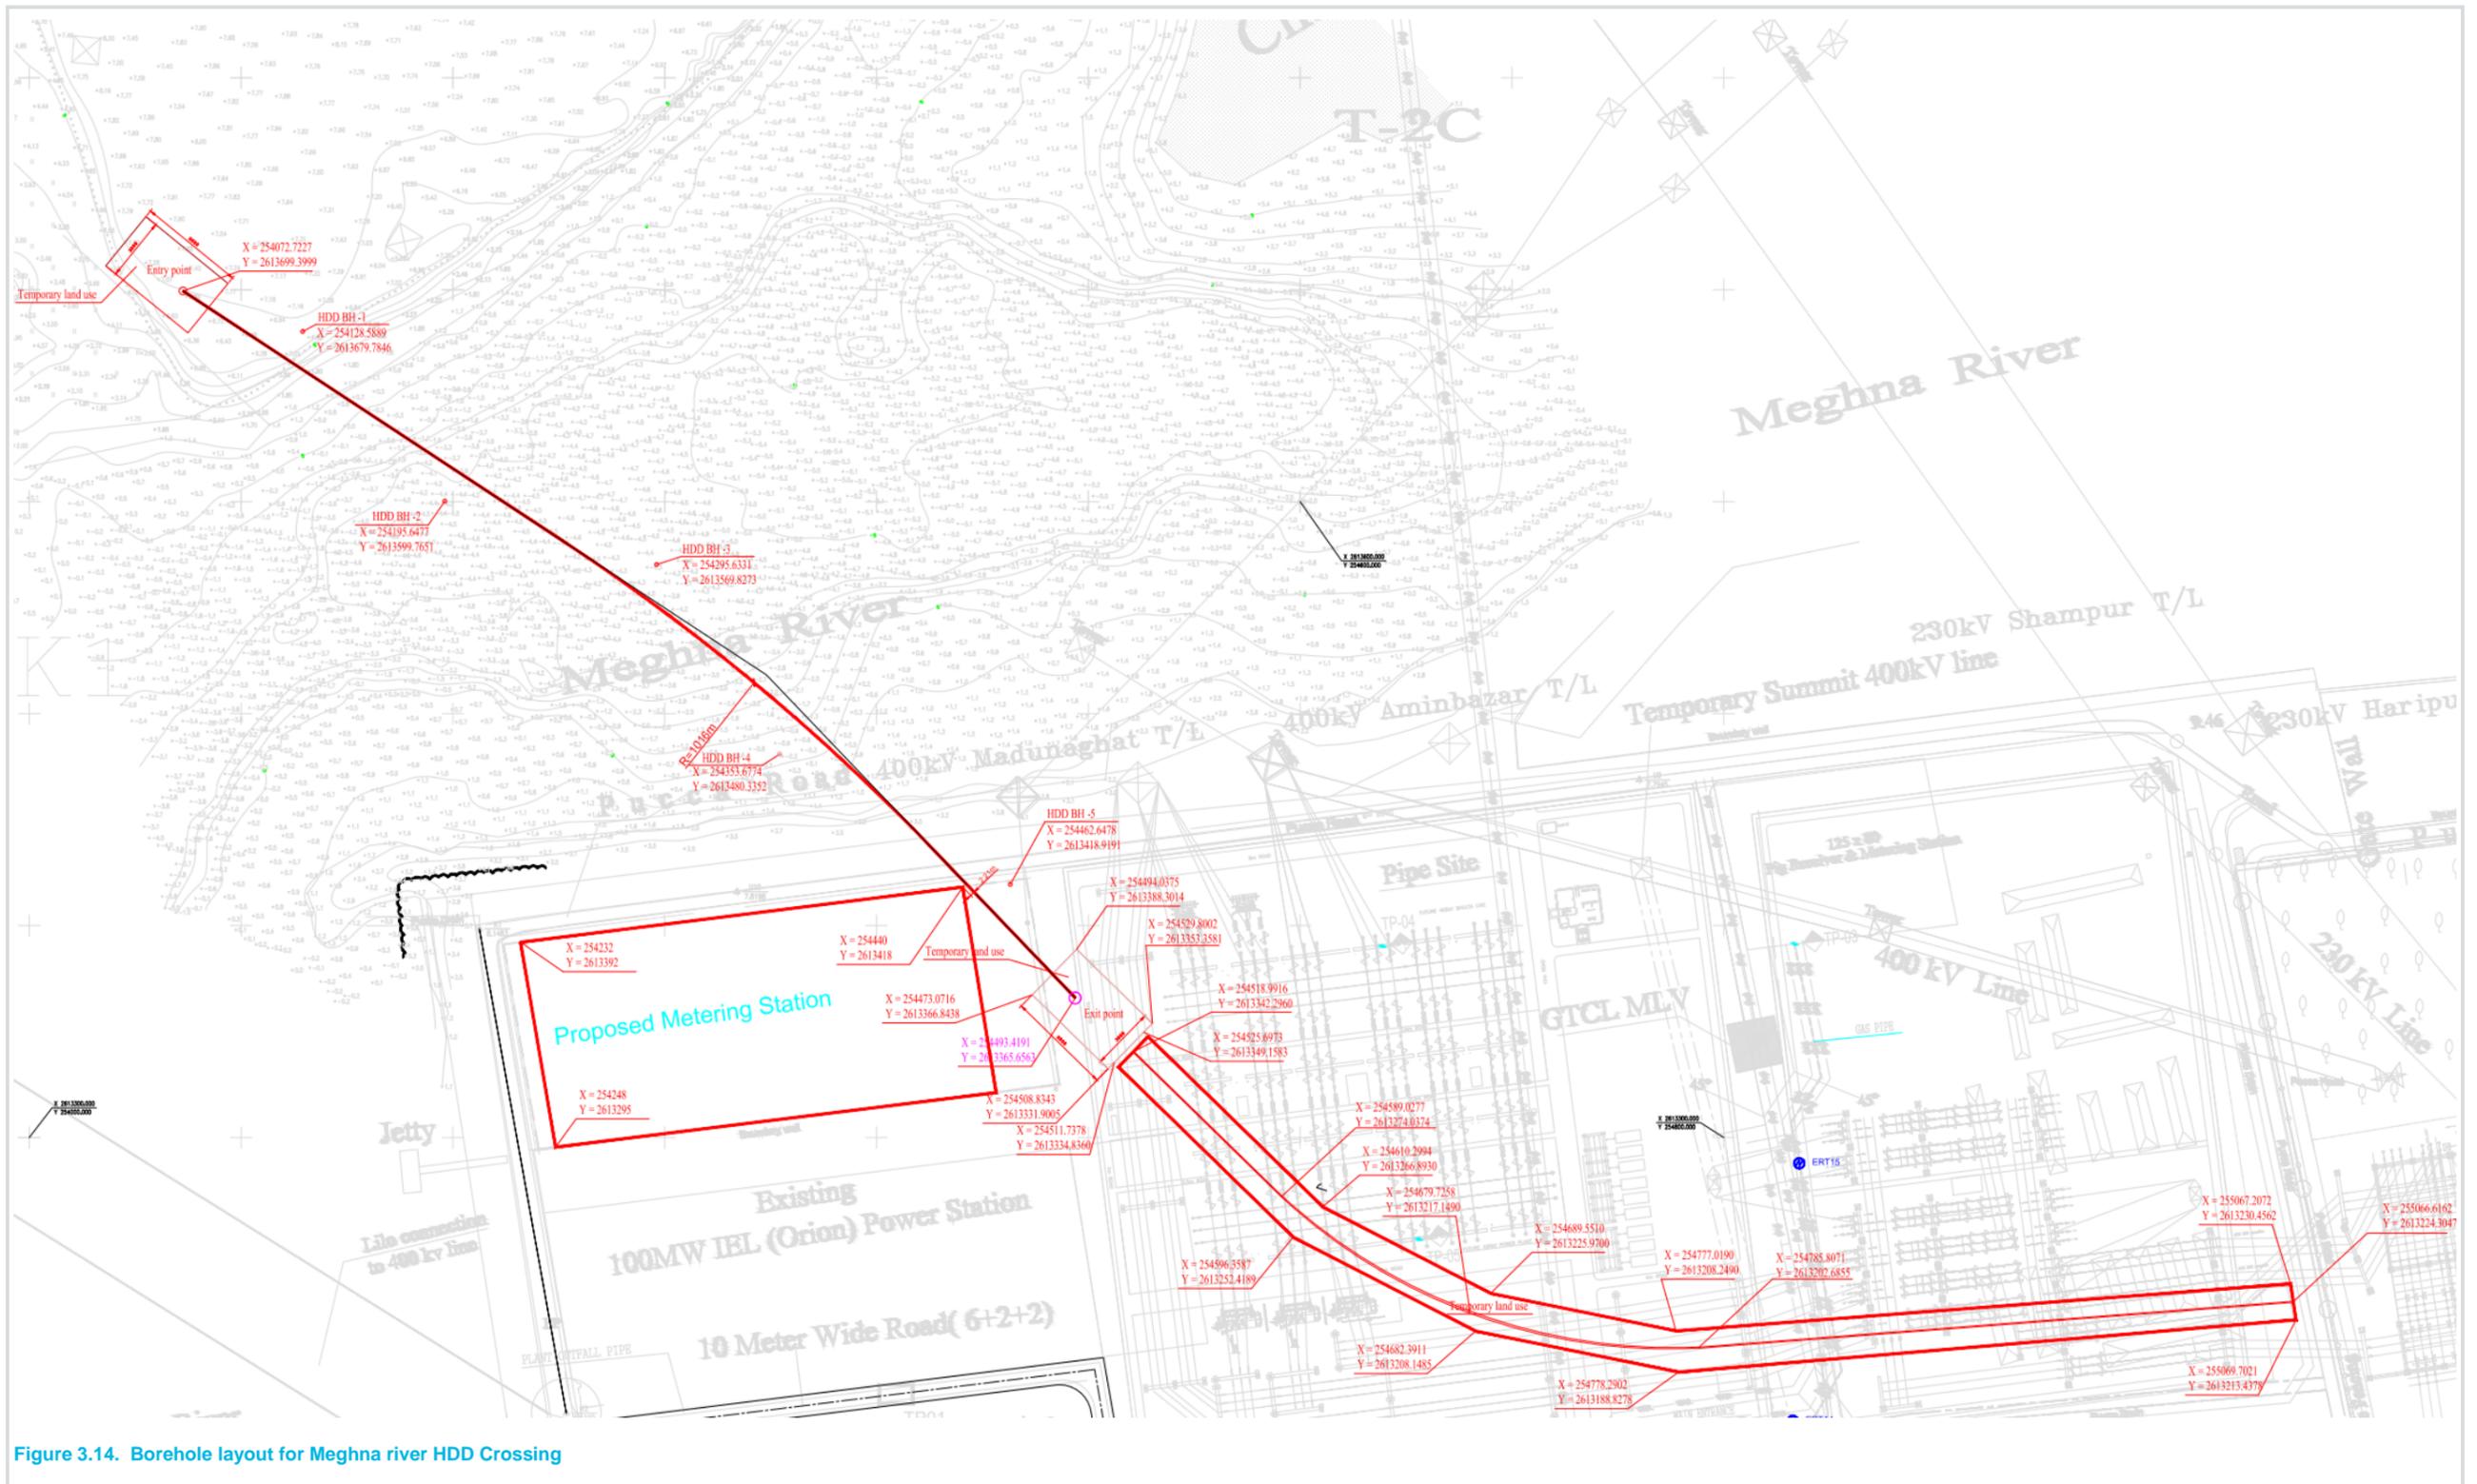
Borehole layout for Meghna river HDD Crossing
